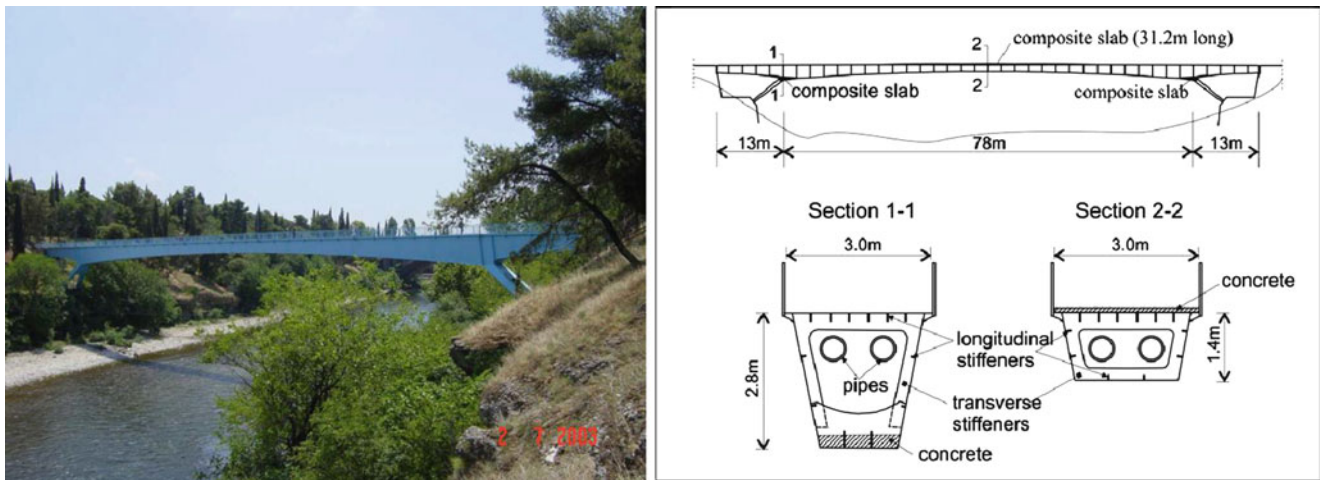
Podgorica footbridge view (left) and general arrangement drawing (right) [5]
